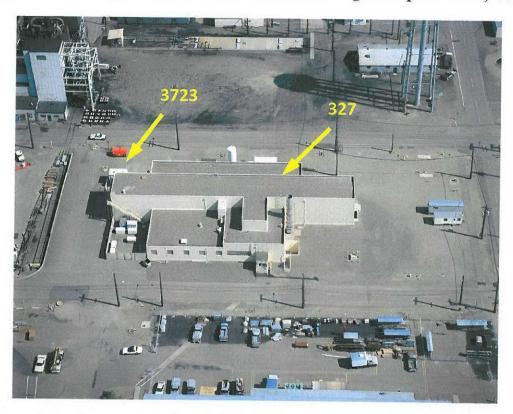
Looking northwest at the 327 Building on November 8, 2005.
